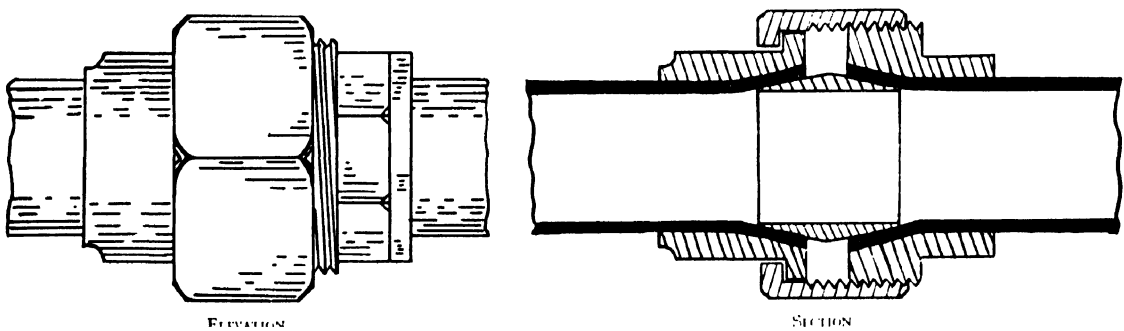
COMPRESSION JOINT, COPPER PIPE WORK
